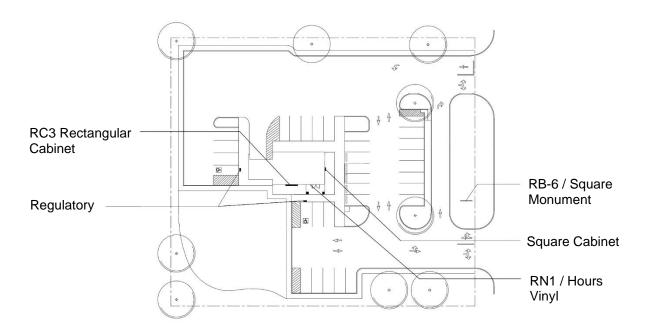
Typical site plan showing sign placement for CSF Small plan 15, 20
